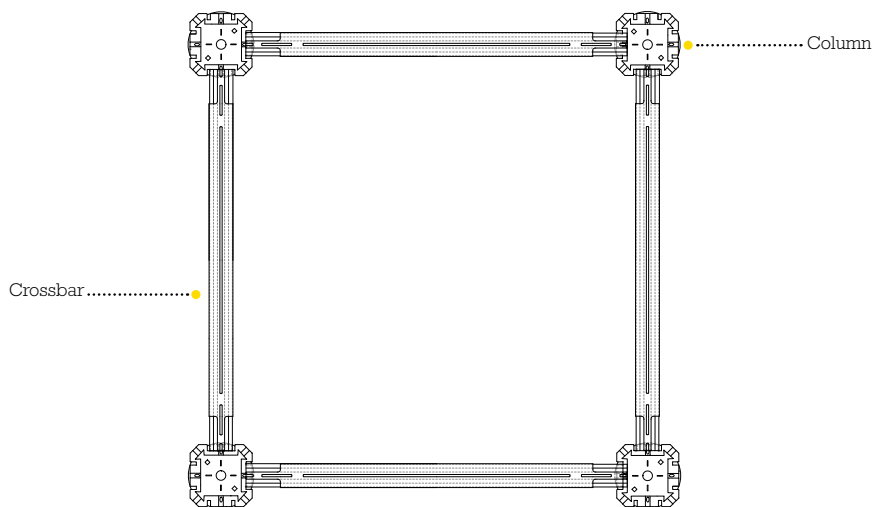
Construction detail - Joints of the display wall | Cross section.
